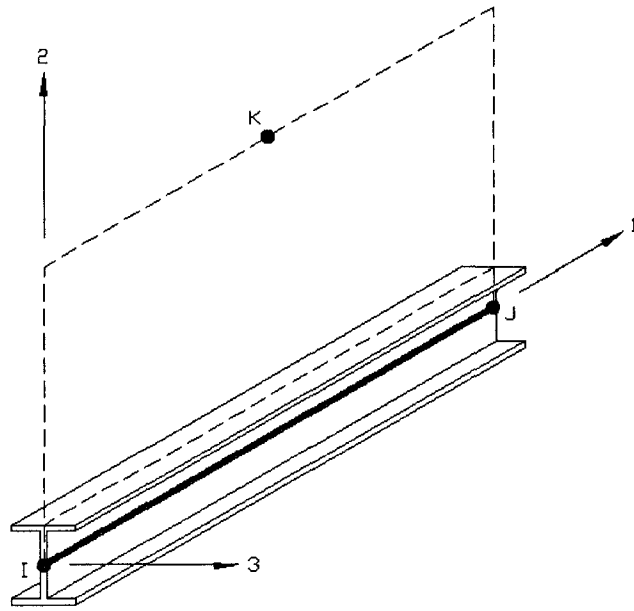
Type 2 beam element orientation in 3-D space
